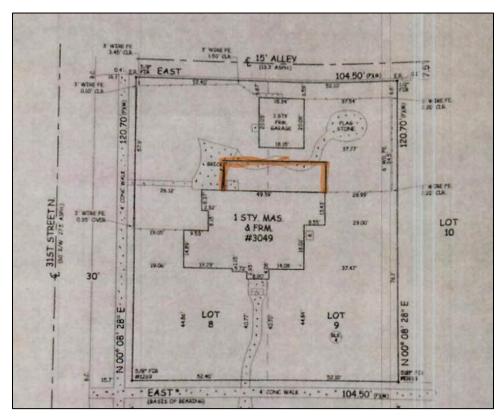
Proposed location of 11-foot by 40-foot porch; image from application
